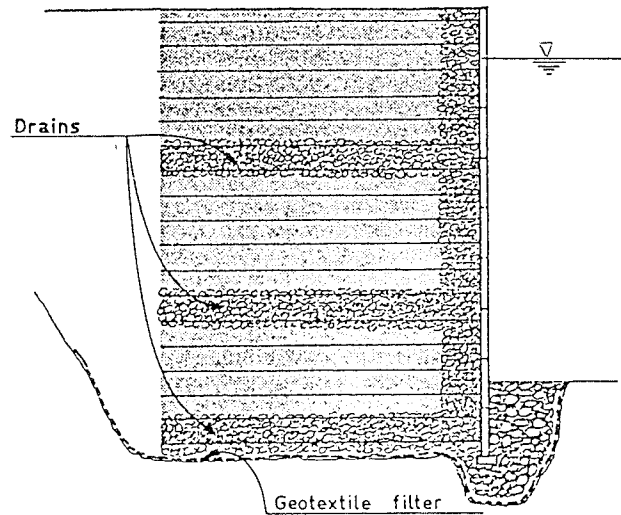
Example of a drainage system for a submerged Reinforced Earth wall.
